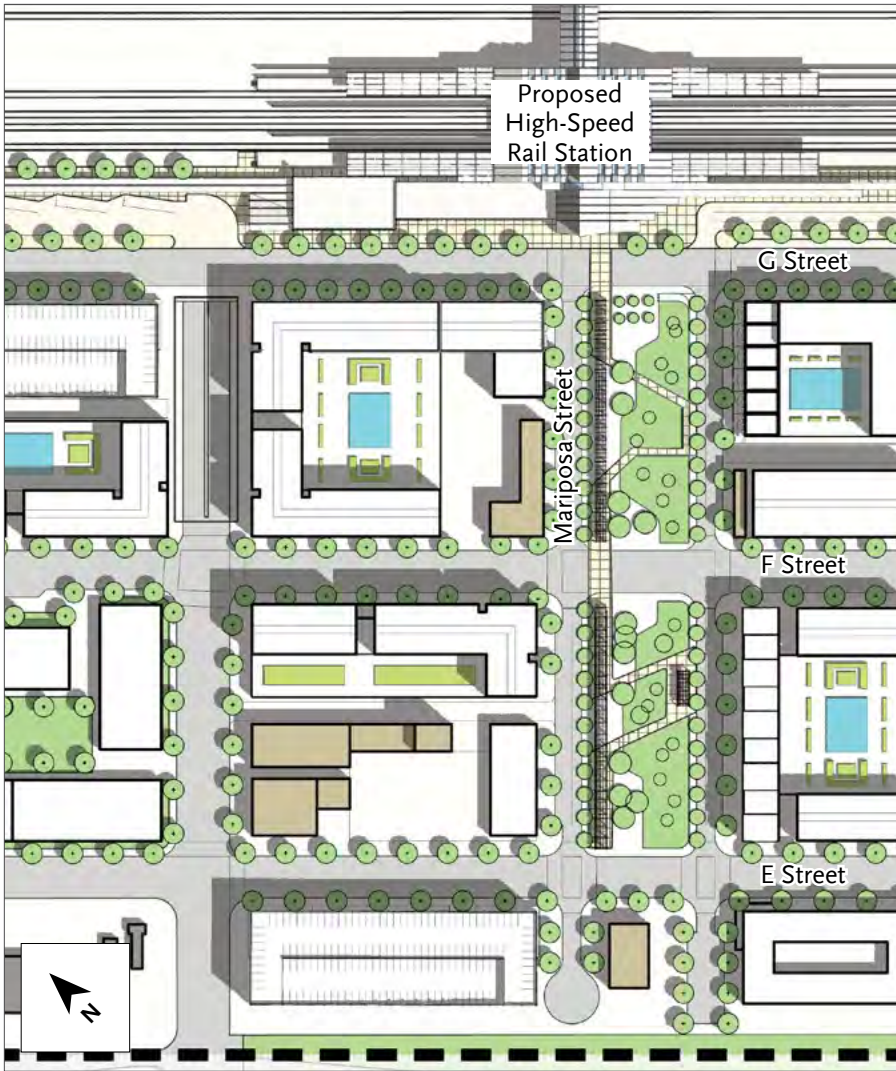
F - Transit Plaza/Green - Illustrative plan showing the new Chinatown Park located just to the west of the proposed High-Speed Rail station
